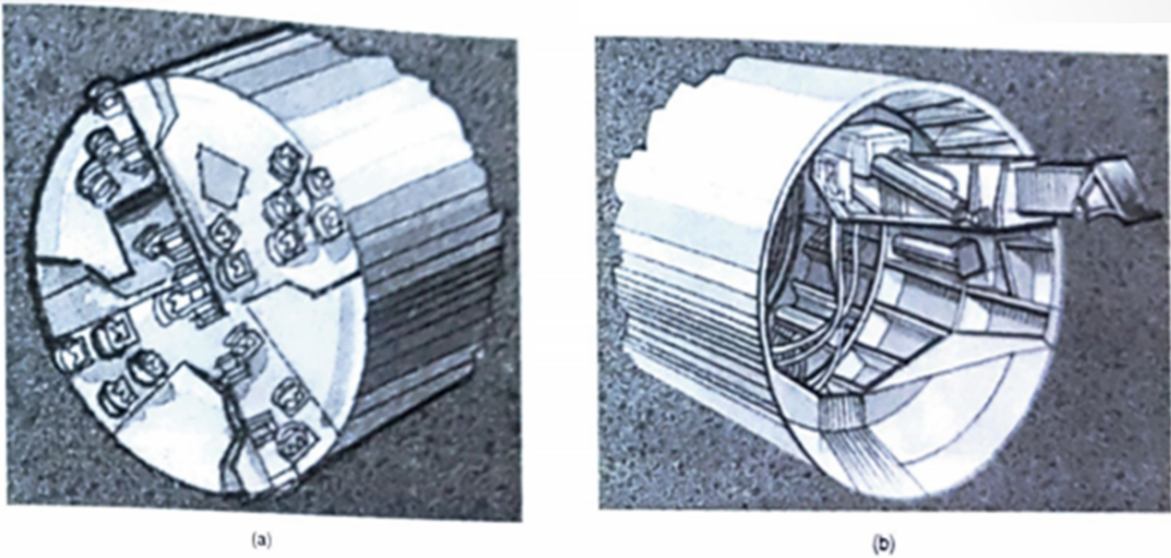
(a) Open shield wheel TBM. (b) Excavator TBM. (Source: Pipe Jacking Association.)
